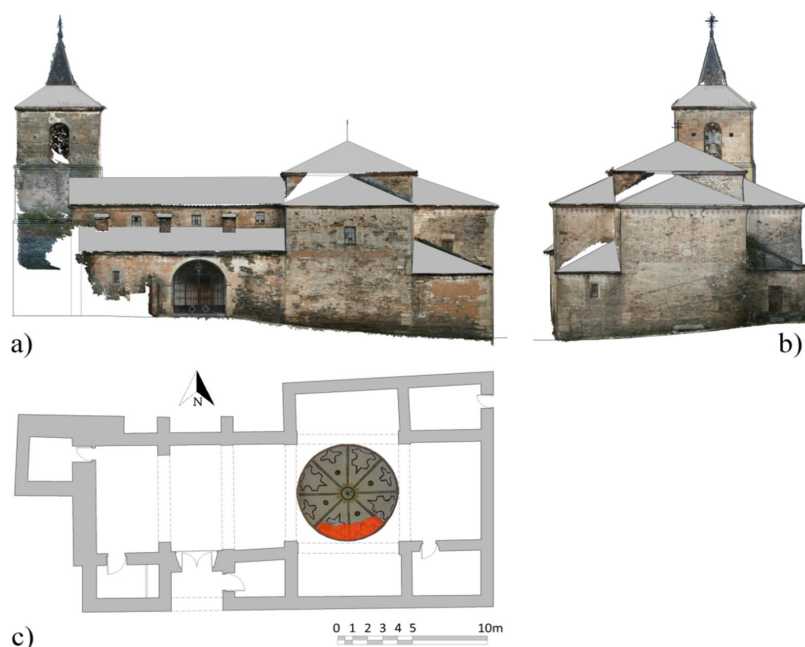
San Lorenzo church: (a) Orthophoto of the main façade through the methodology proposed; (b) Orthophoto of the west façade (chancel) of the construction; (c) Floor plan-view of the church, red color indicates the damaged area of the dome.
